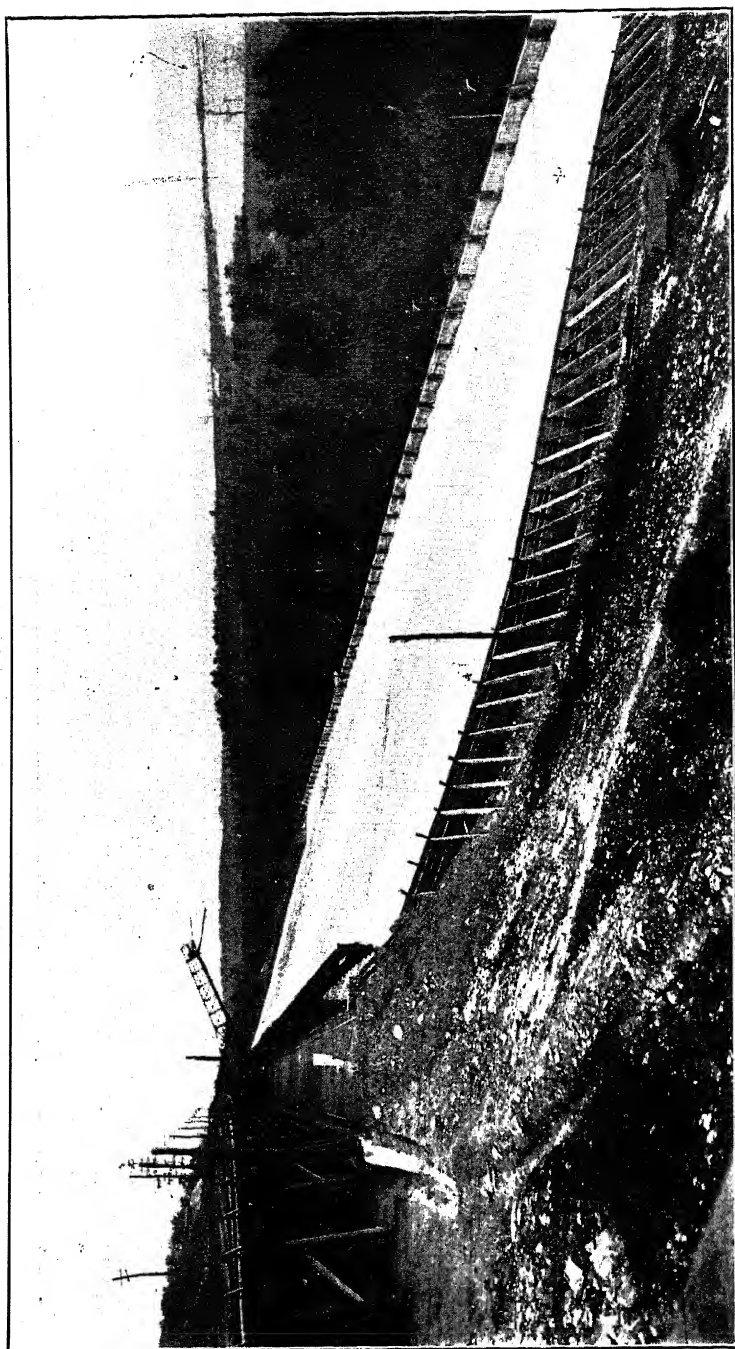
CONCRETE FLOOR, WITH CORRUGATIONS AGAINST RETAINING-WALL AT BOTTOM. HUDSONDALE STORAGE-PLANT,
